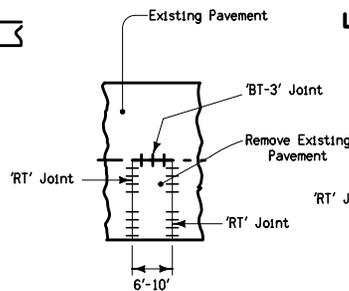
DETAIL FOR 'RT' OR 'RD' JOINT BAR SPACING
